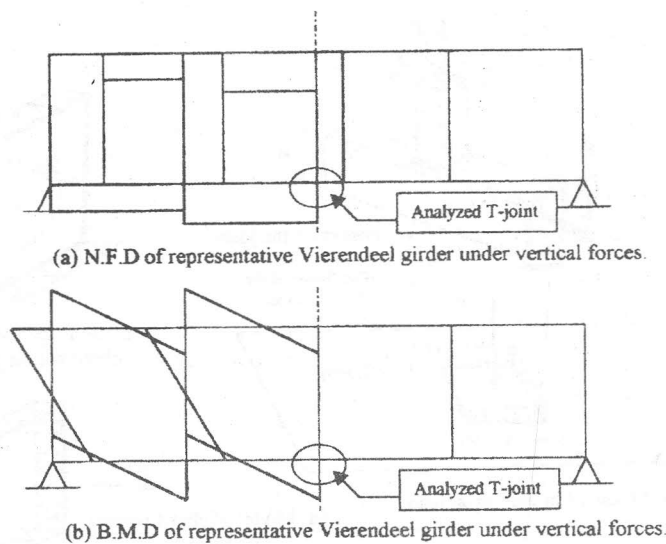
Expected internal forces developed in a Vierendeel girder under vertical forces
